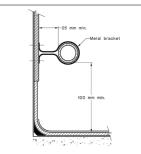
TYPICAL CLEARANCES FOR SERVICE PIPES AND CONDUITS
